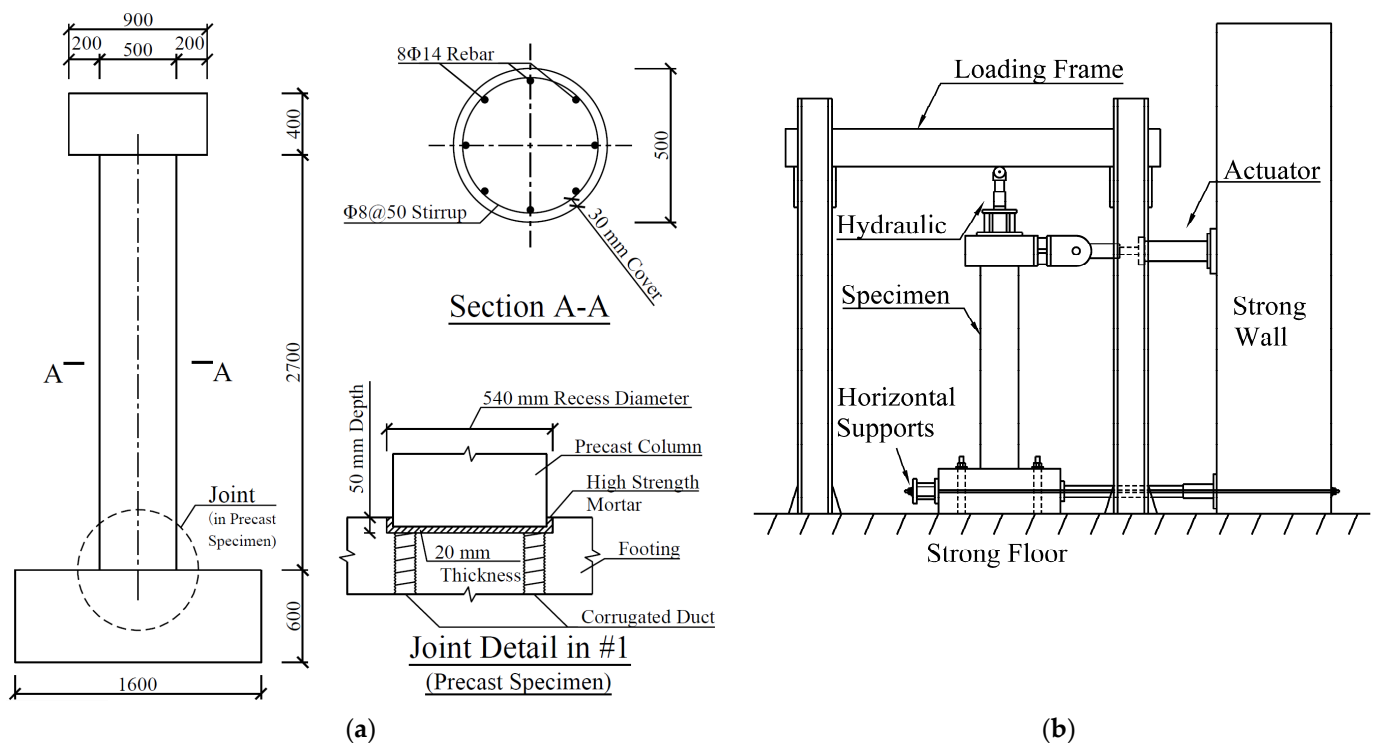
Test (a) specimen design (unit: mm); (b) setup.
